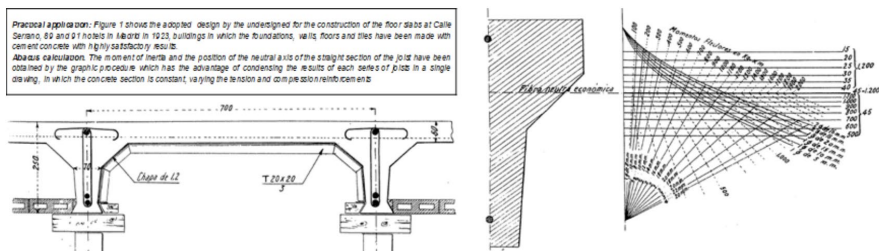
Design of reinforced concrete floors and abacus. Source: (Laffón 1925)
